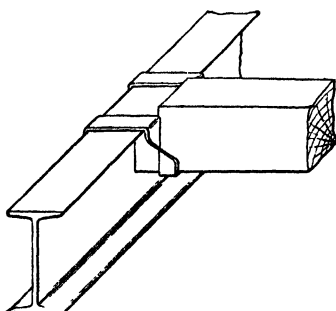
Wooden Beam Framed to I Beam with Stirrup-hanger
